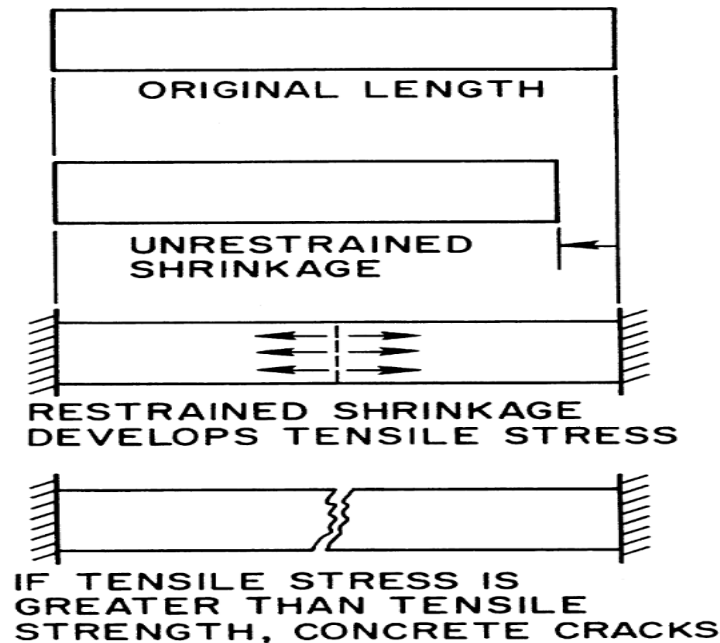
Cracking of Concrete Due to Cracking Shrinkage [ACI 224R-01]
